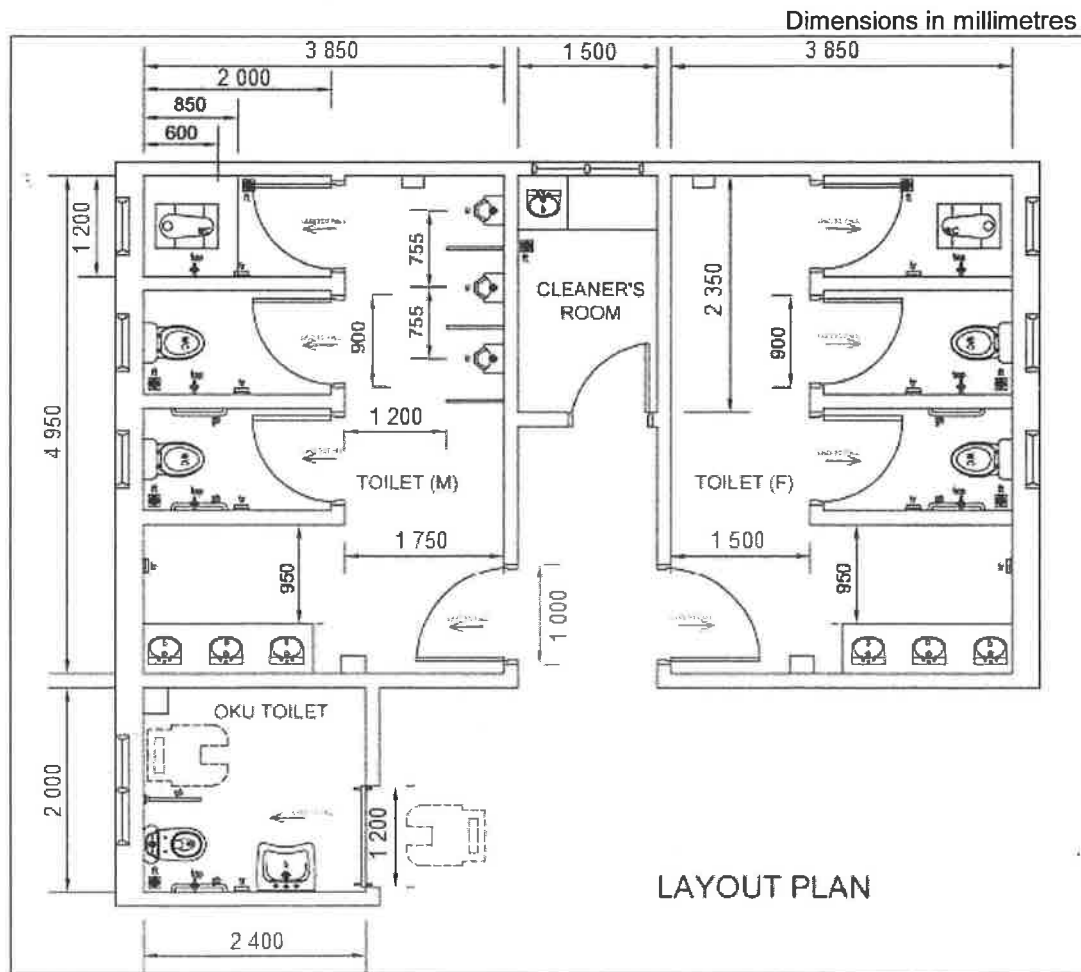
Male, female, cleaner's room and accessible toilet - Layout plan
